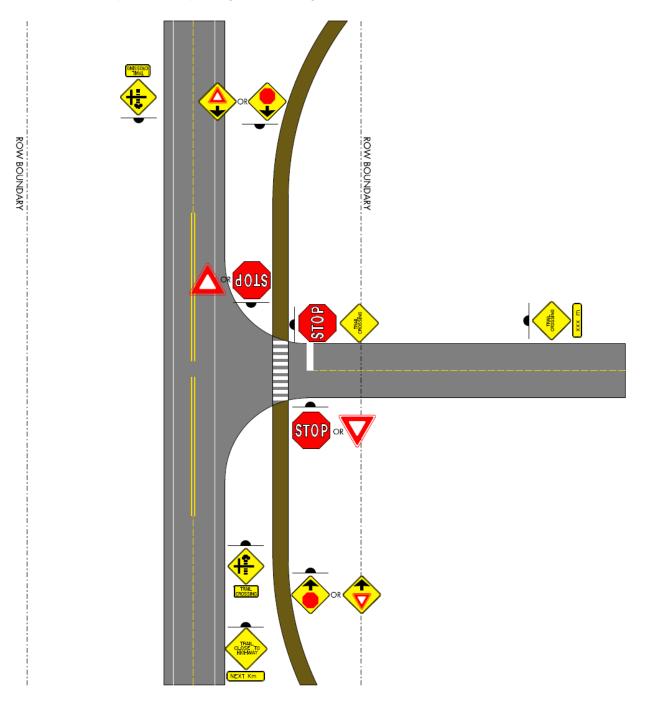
Typical arrangement for trail crossing of minor local road inside the Clear Zone (Alberta Transportation, 2015)
